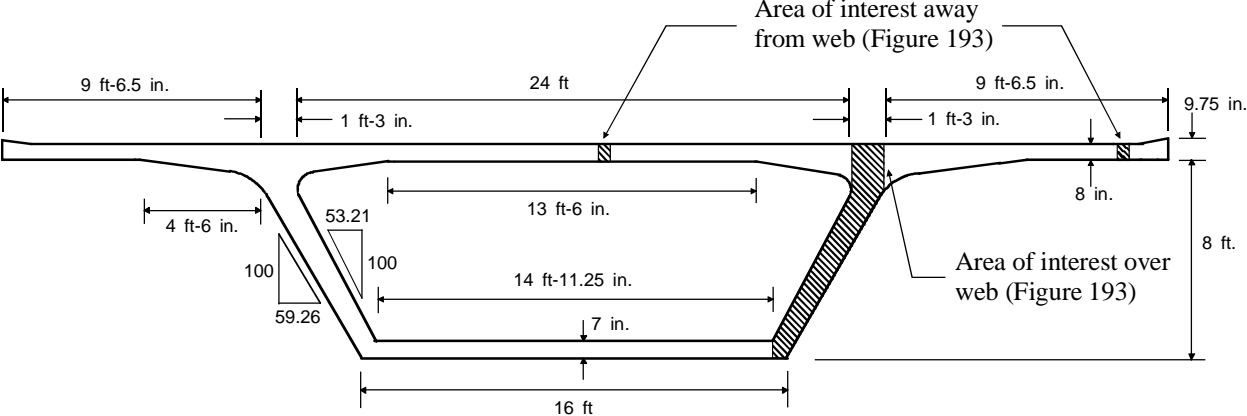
Typical cross section of Santa Rosa Bay Bridge
